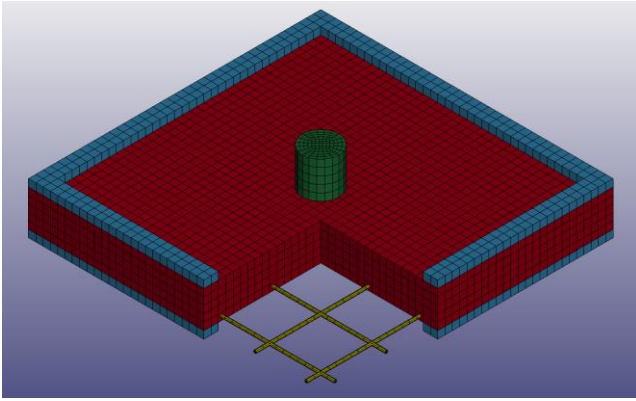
The FEM of the rigid hammer, steel reinforcement, the RC slab, and the rigid support.
